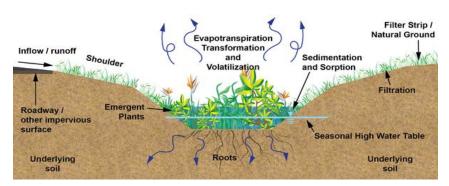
Cross section of a vegetative swale (Swale Terminology for Urban Stormwater Treatment | NC State Extension Publications, n.d.)
